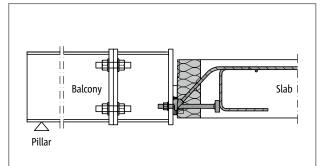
Schöck Isokorb® T type SQ: Steel stub adjuster between the Isokorb® and the balcony supports flexible construction workflows
